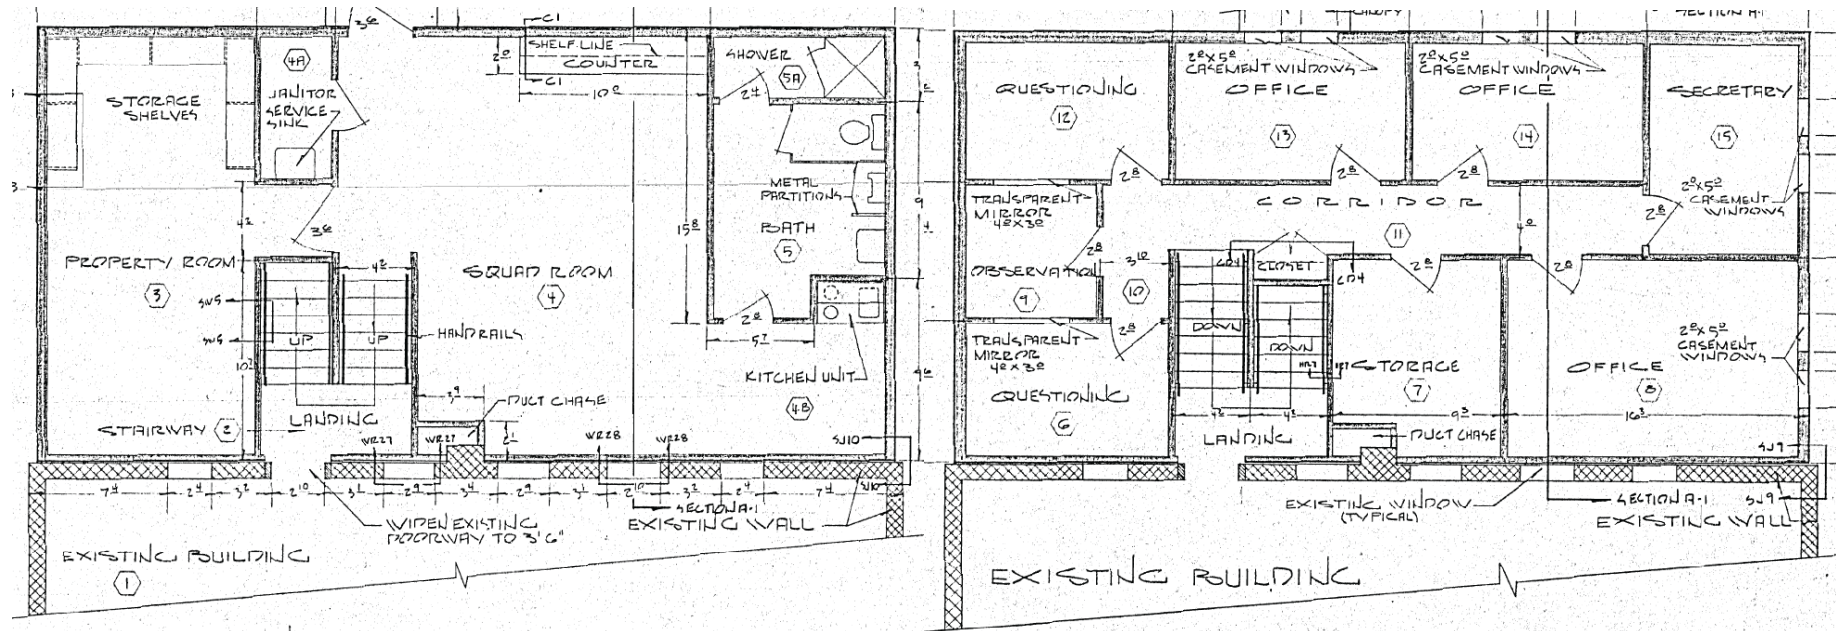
(LEFT): Architectural drawing for first floor of the 1980 addition (A.J. McMurry Company, Sheet 2).
